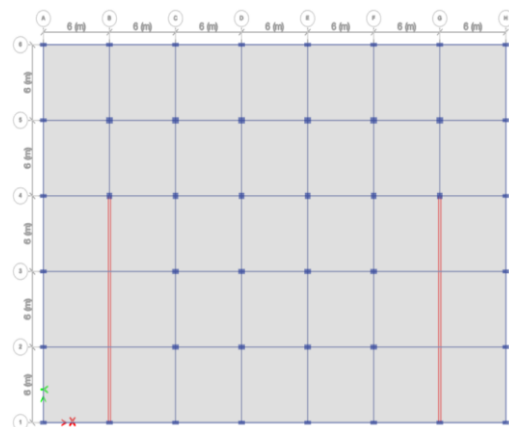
Model 2 – Rectangular shear walls placed eccentrically
